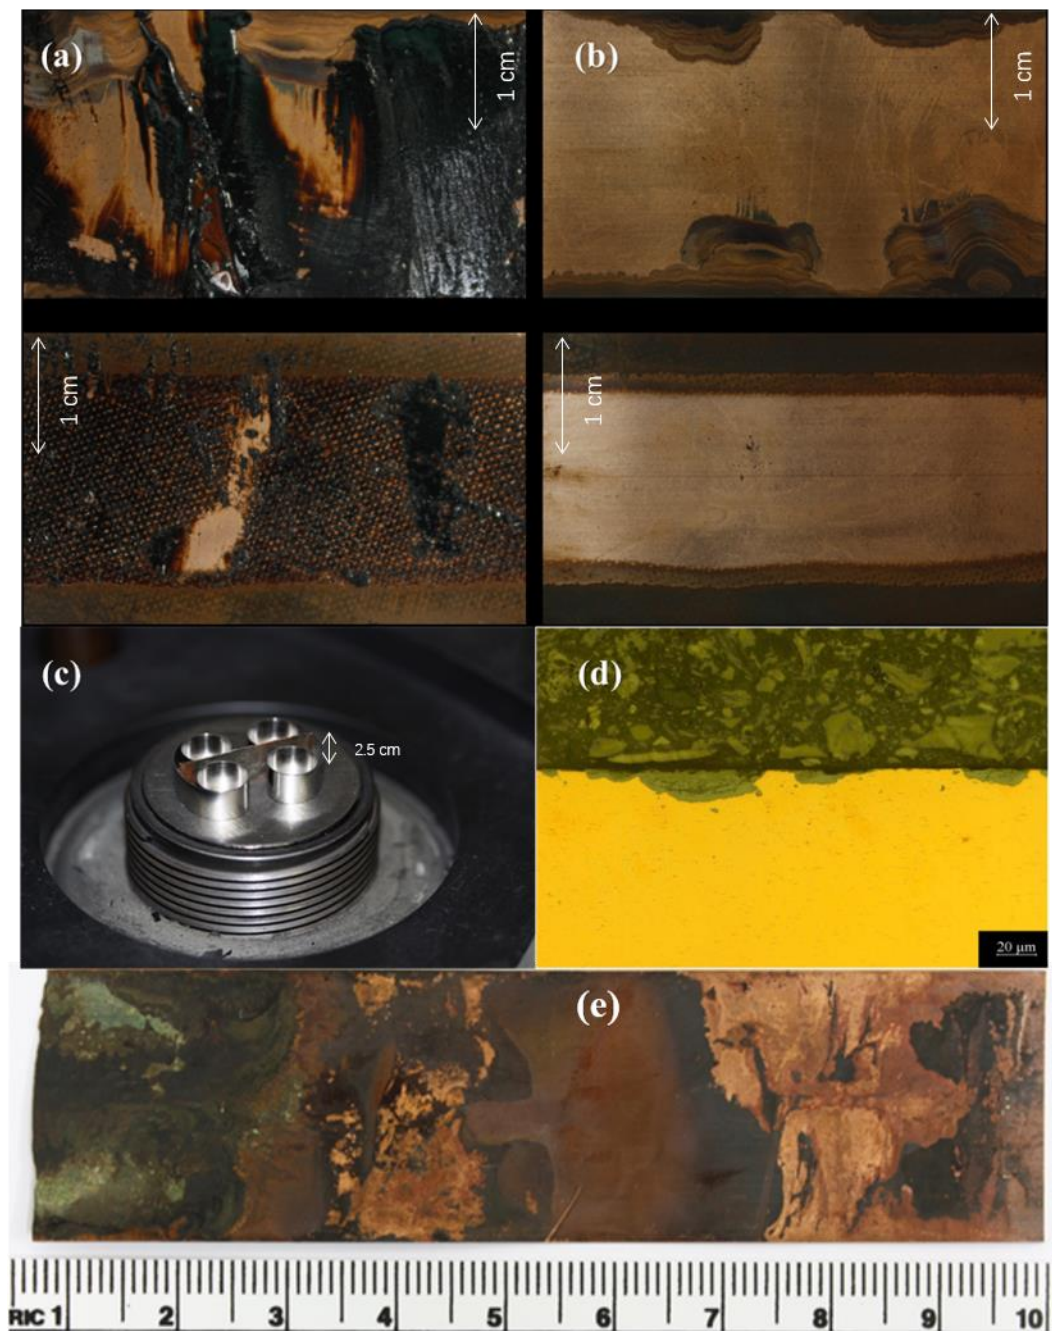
(a) Outer and inner surface of the tape covered with bitumen (b) Outer and inner surface of the tape after bitumen removal with pentane (c) Example of tape in the mounting machine. Note the supporting clips necessary due to the small thickness of the tape (d) Cross-sectional view of the corrosion pits that are taken perpendicularly to the longitudinal axis of the tape (e) Corroded reinforcing phosphor bronze tape surface with a fracture end on the left (thickness of the tape about 150 μm) [5]
